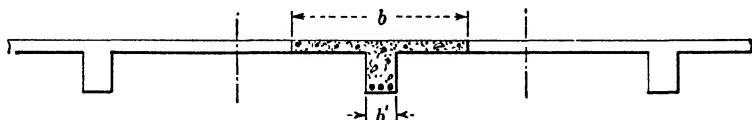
Section Showing T-Beam in Floor. (See p. 215.)
